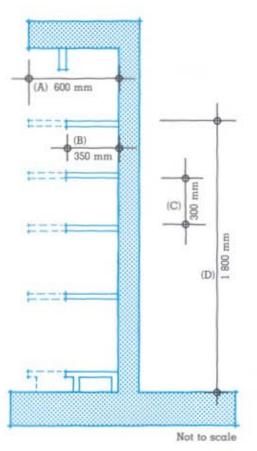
Cross-section showing minimum and maximum linen closet dimensions for convenient storage
